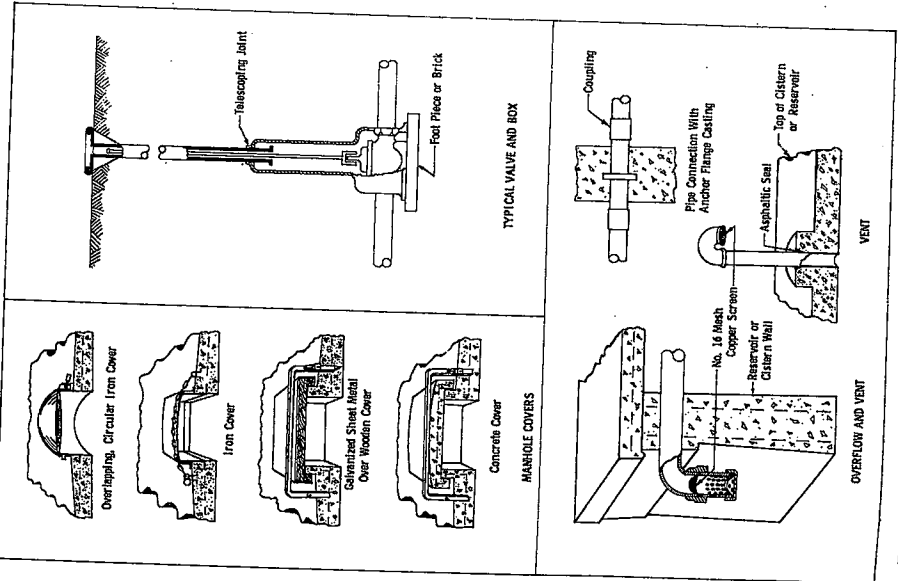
Typical valve and box, manhole covers and piping installations.
